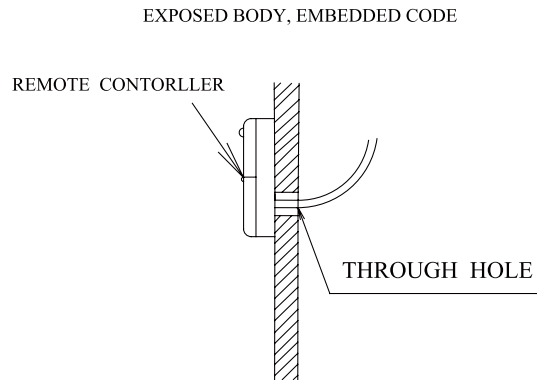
Fig.2 Concealed mounting of Cable
